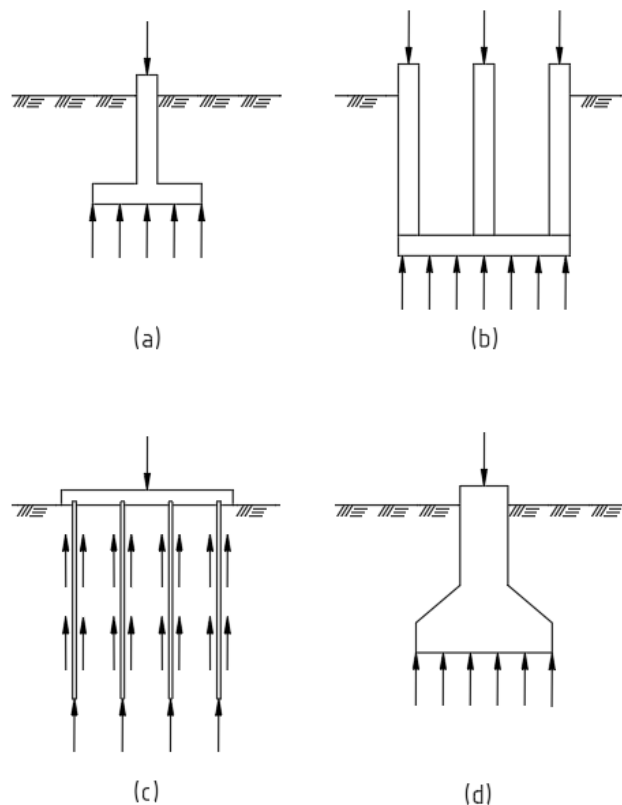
Different types of foundations. (a) spread footing; (b) mat foundation; (c) pile foundation; (d) drilled shaft foundation. Inspired by Das (2002).
